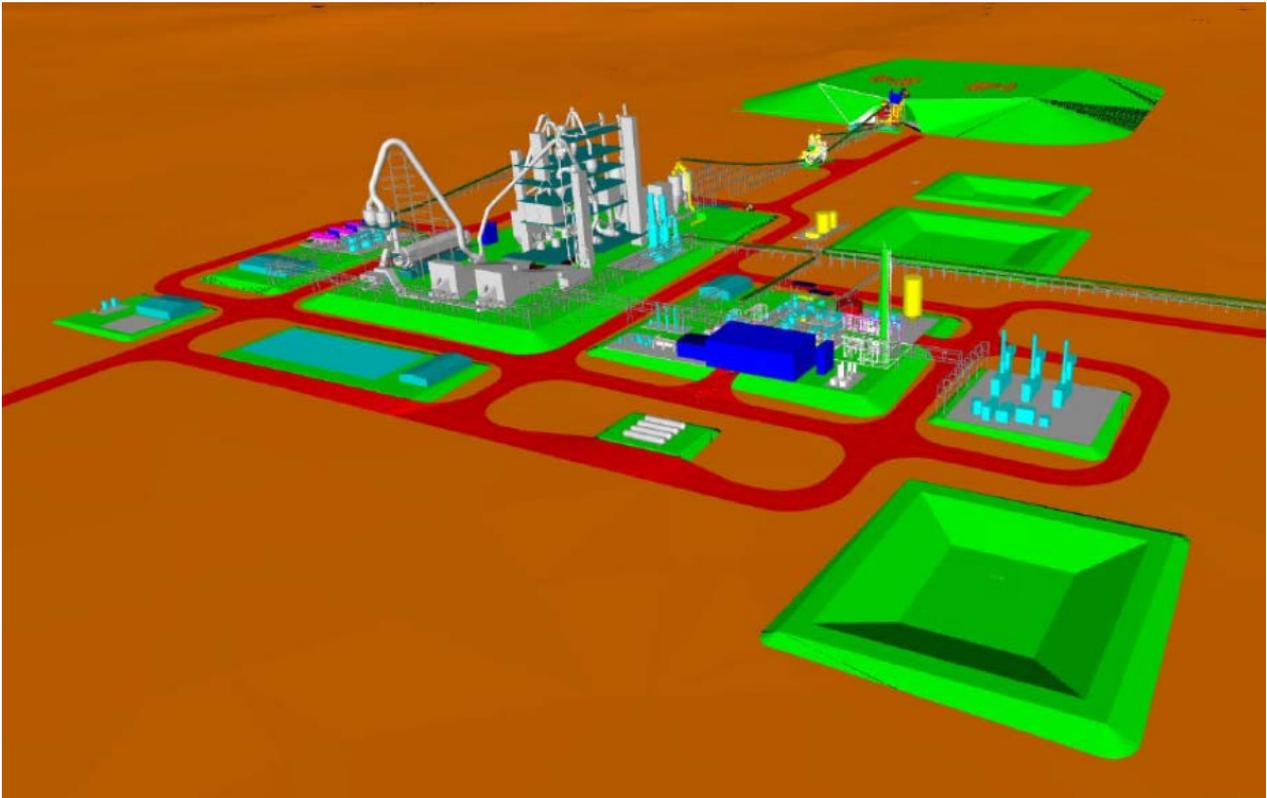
FIGURE: Oblique view looking south-east at the Oxley process plant, pit and mine waste facilities designs.
